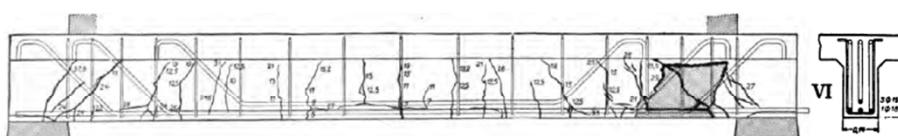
Beam VI, breaking load 37.8 t. (41.5 tons).
